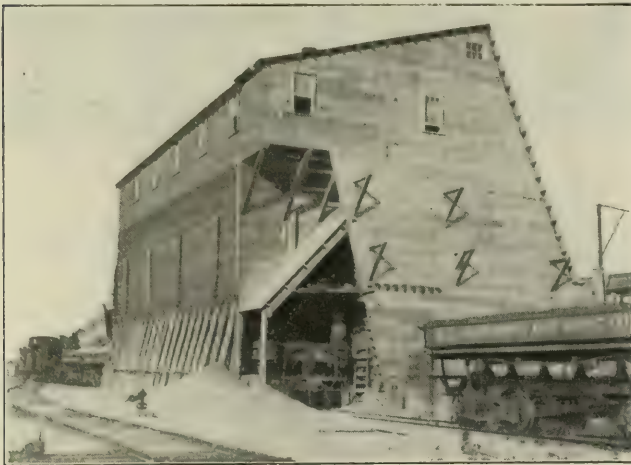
LOADING MIXED AGGREGATE AT MIXING PLANT
